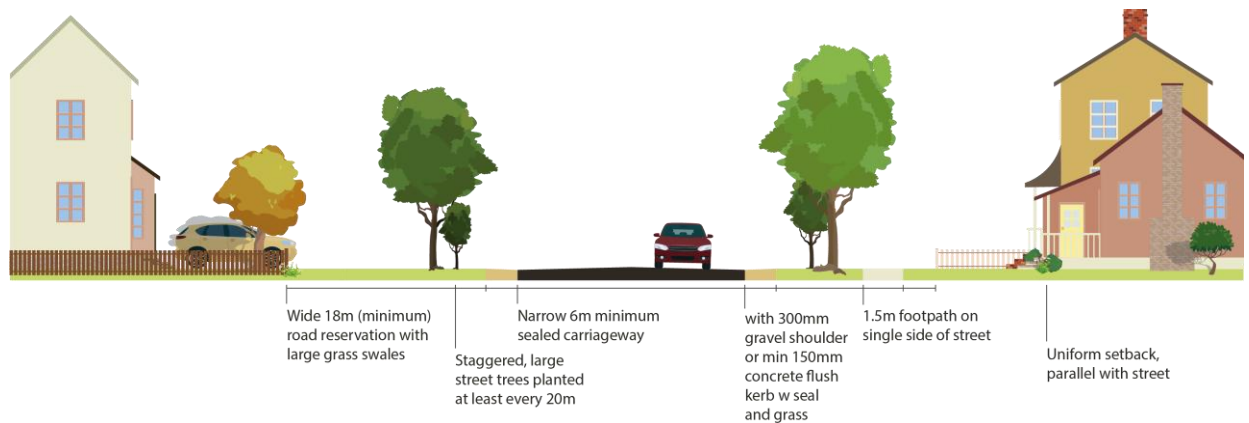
B: Cross-Section of Carrick Streetscape and Road Layout Diagram (Supplied by the Meander Valley Council)
